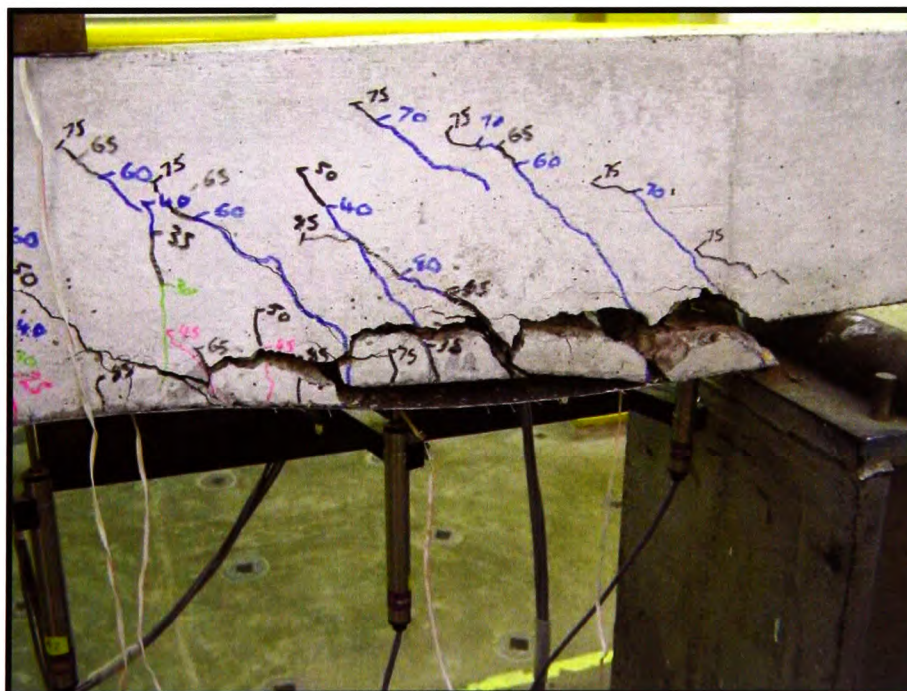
Photograph of failure of 12DCF3 due to tearing-off of the concrete cover
